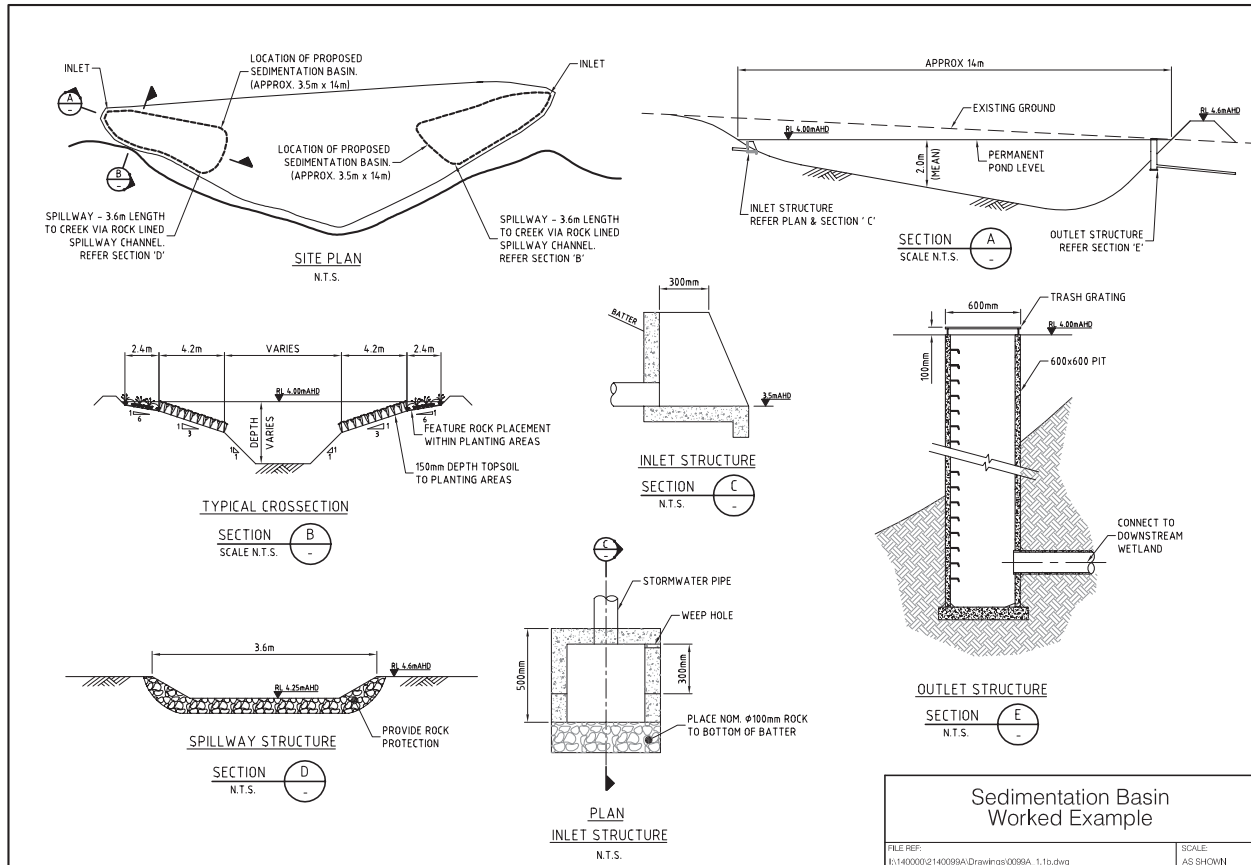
Construction drawing of the sedimentation basin worked example.
